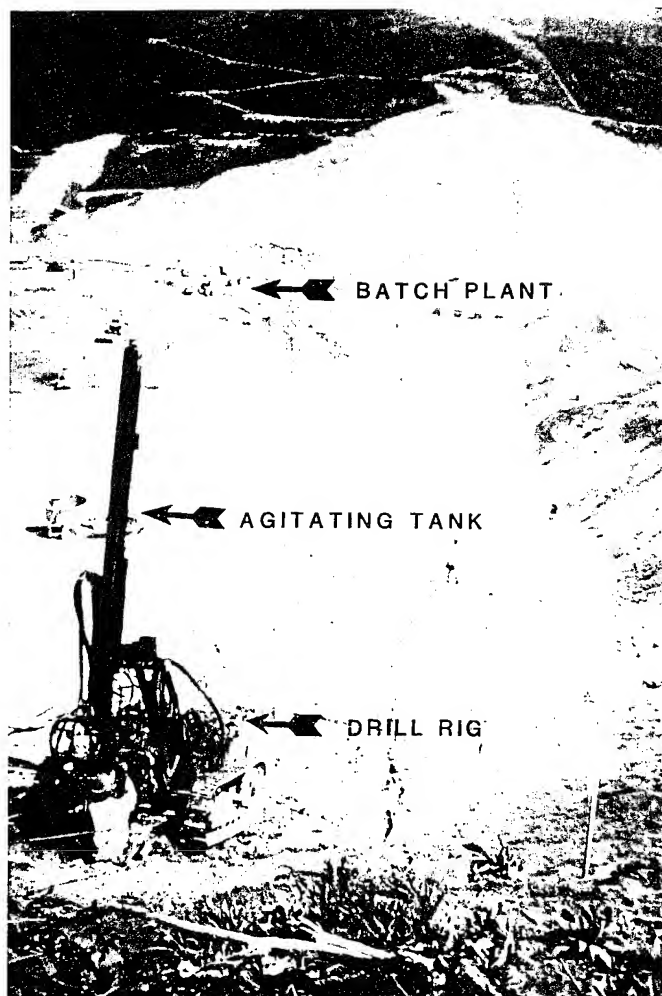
Overall curtain grouting operation viewed from the top of the right abutment.
